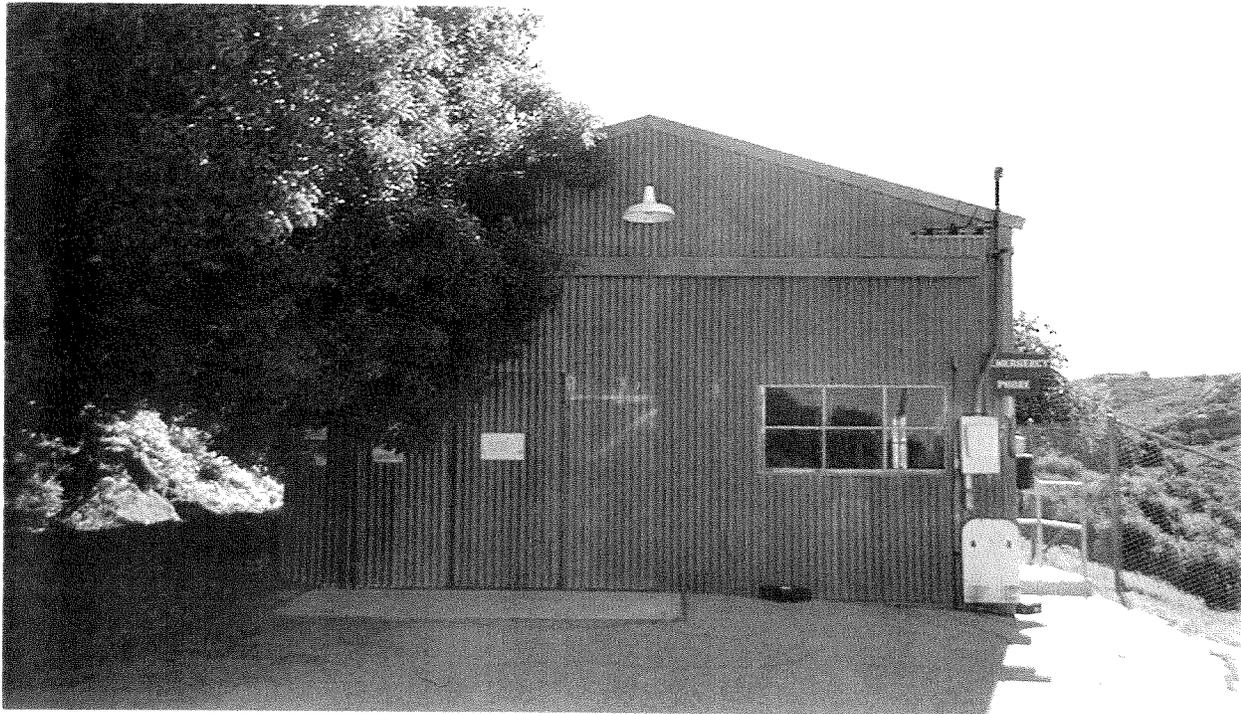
(Above): View of Building T029, note concrete loading pad at entrance, looking East. Concrete loading pad is 10 ft x 4 ft, in front of the 8 ft loading door.
